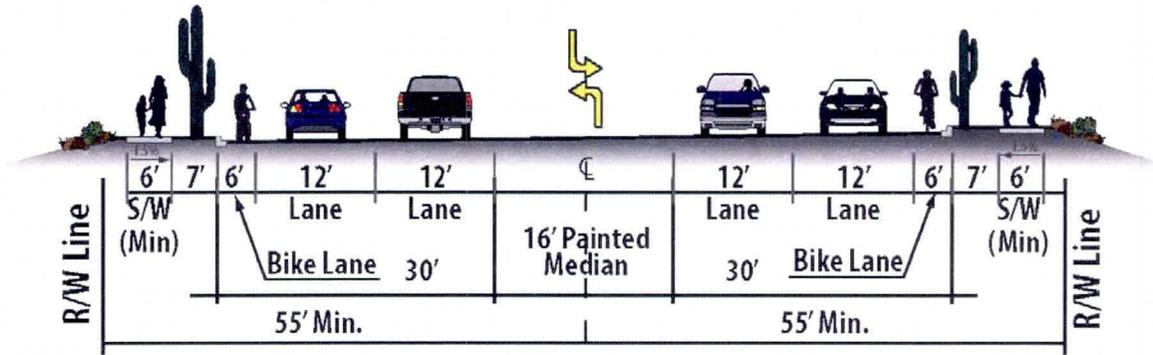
Ultimate Roadway Cross Section – Lost Dutchman Boulevard to Southern Avenue
